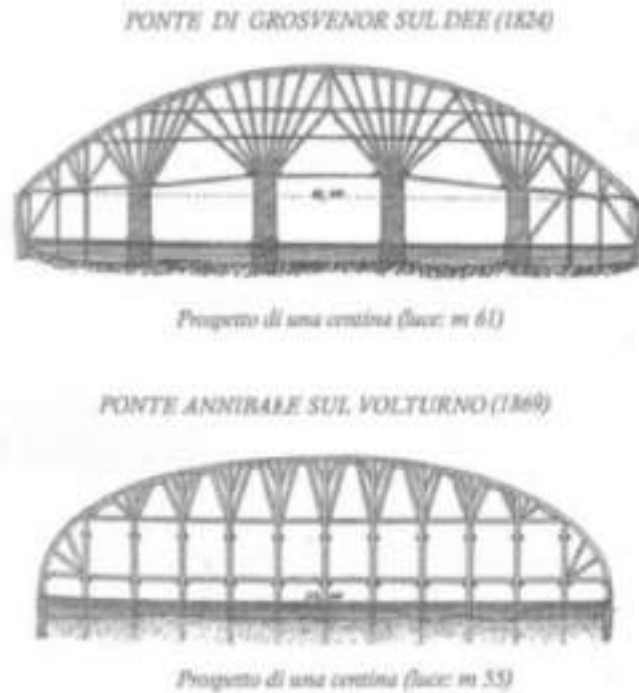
Example of centering: above cantilever centering, below supported centering, (Torre, 2003).
